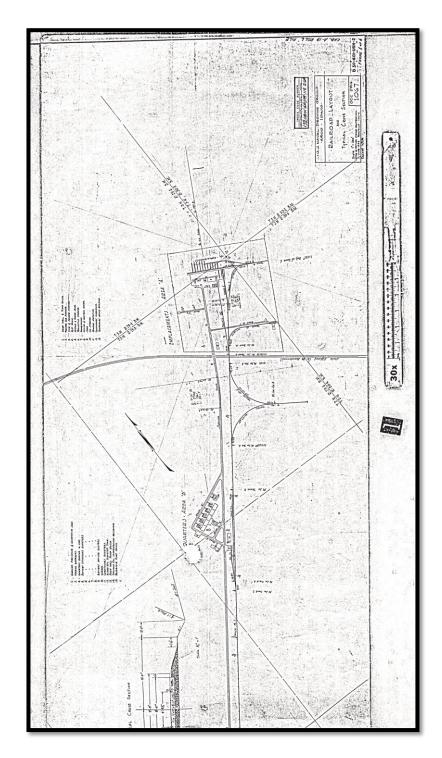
INL drawing number 11264 (B50-801-USN-2); railroad, layout and typical cross section, frame 1 of 4; June 1944.
